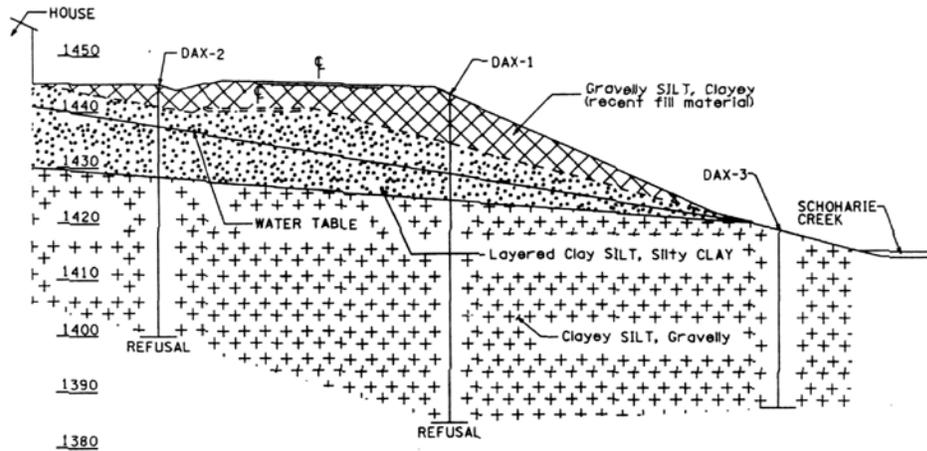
Profile of all soil embankment and subsurface soils (Jutkofsky 1998).
